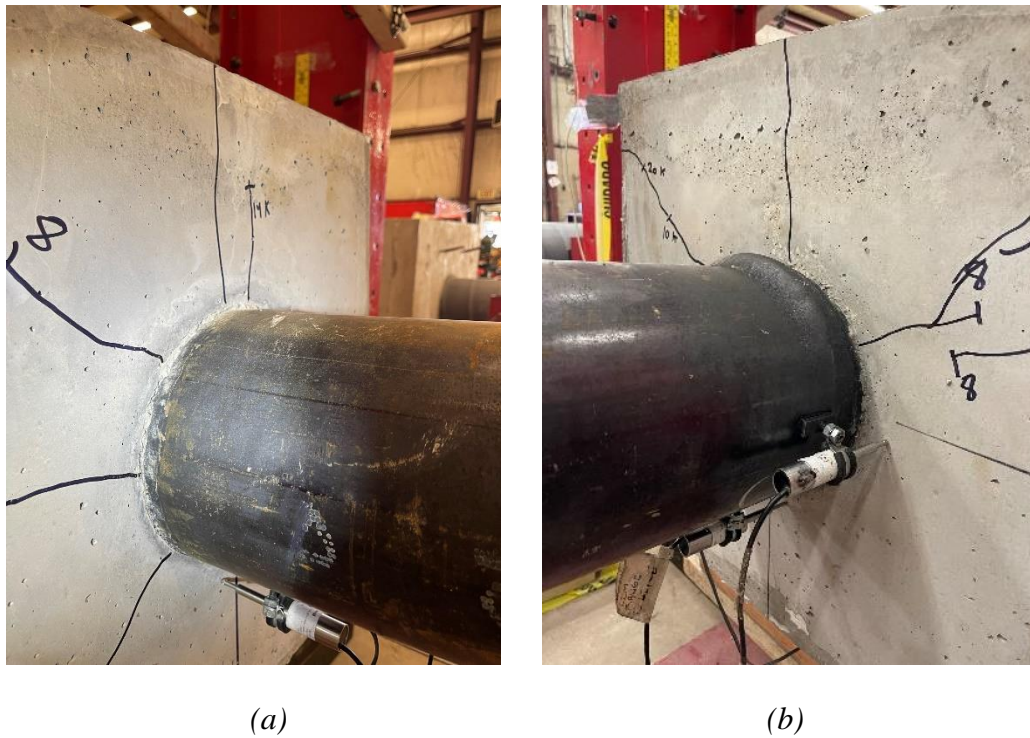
Steel pipe at the (a) north side and (b) south side of the footing at failure for specimen CF-2
